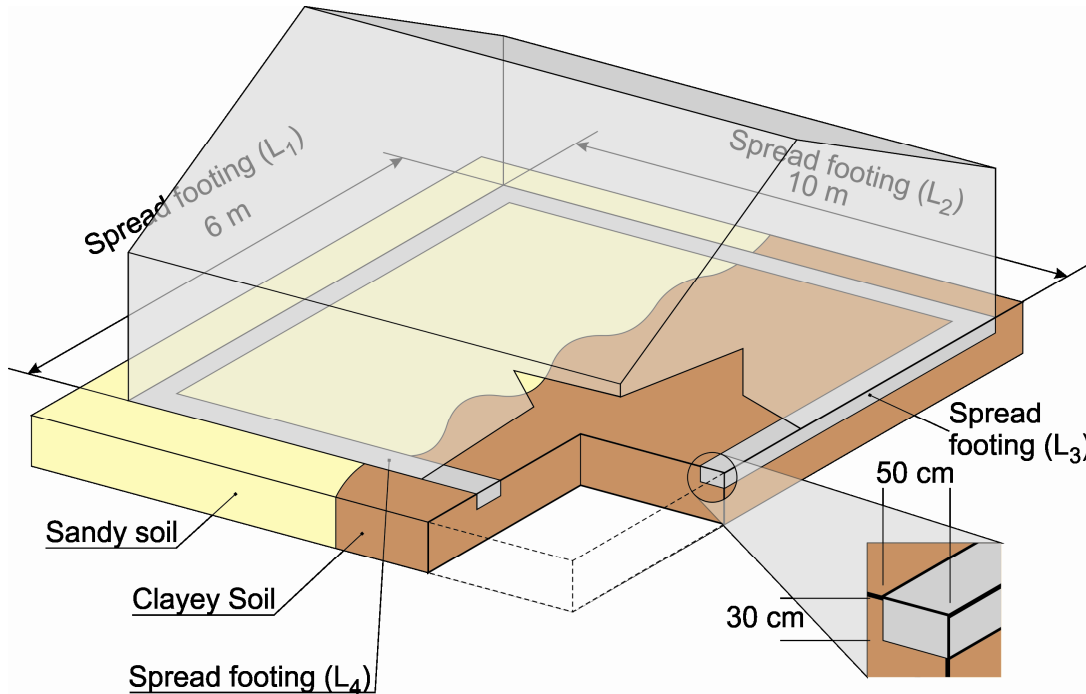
Constructed individual house with the four spread footings on the experimental site of Pessac
